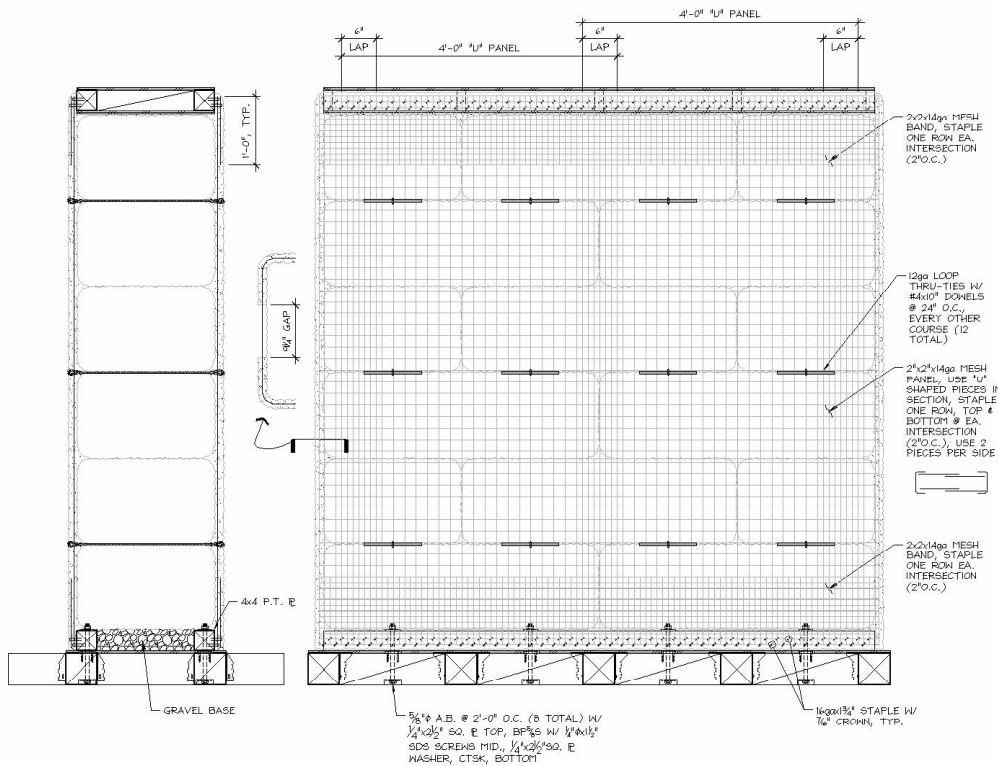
Details of Wall E (Cement stucco plaster with intermediate detailing)
